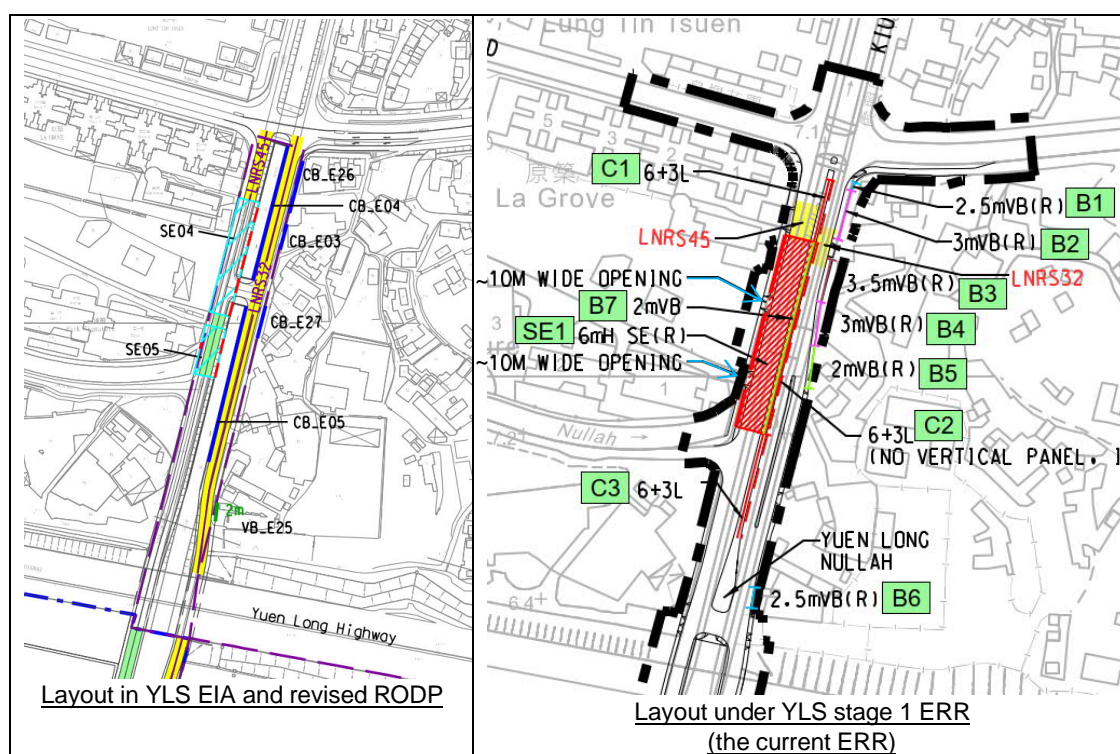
Proposed full decking along Kung Um Road and Kiu Hing Road under ERR for YLS stage 1 works
